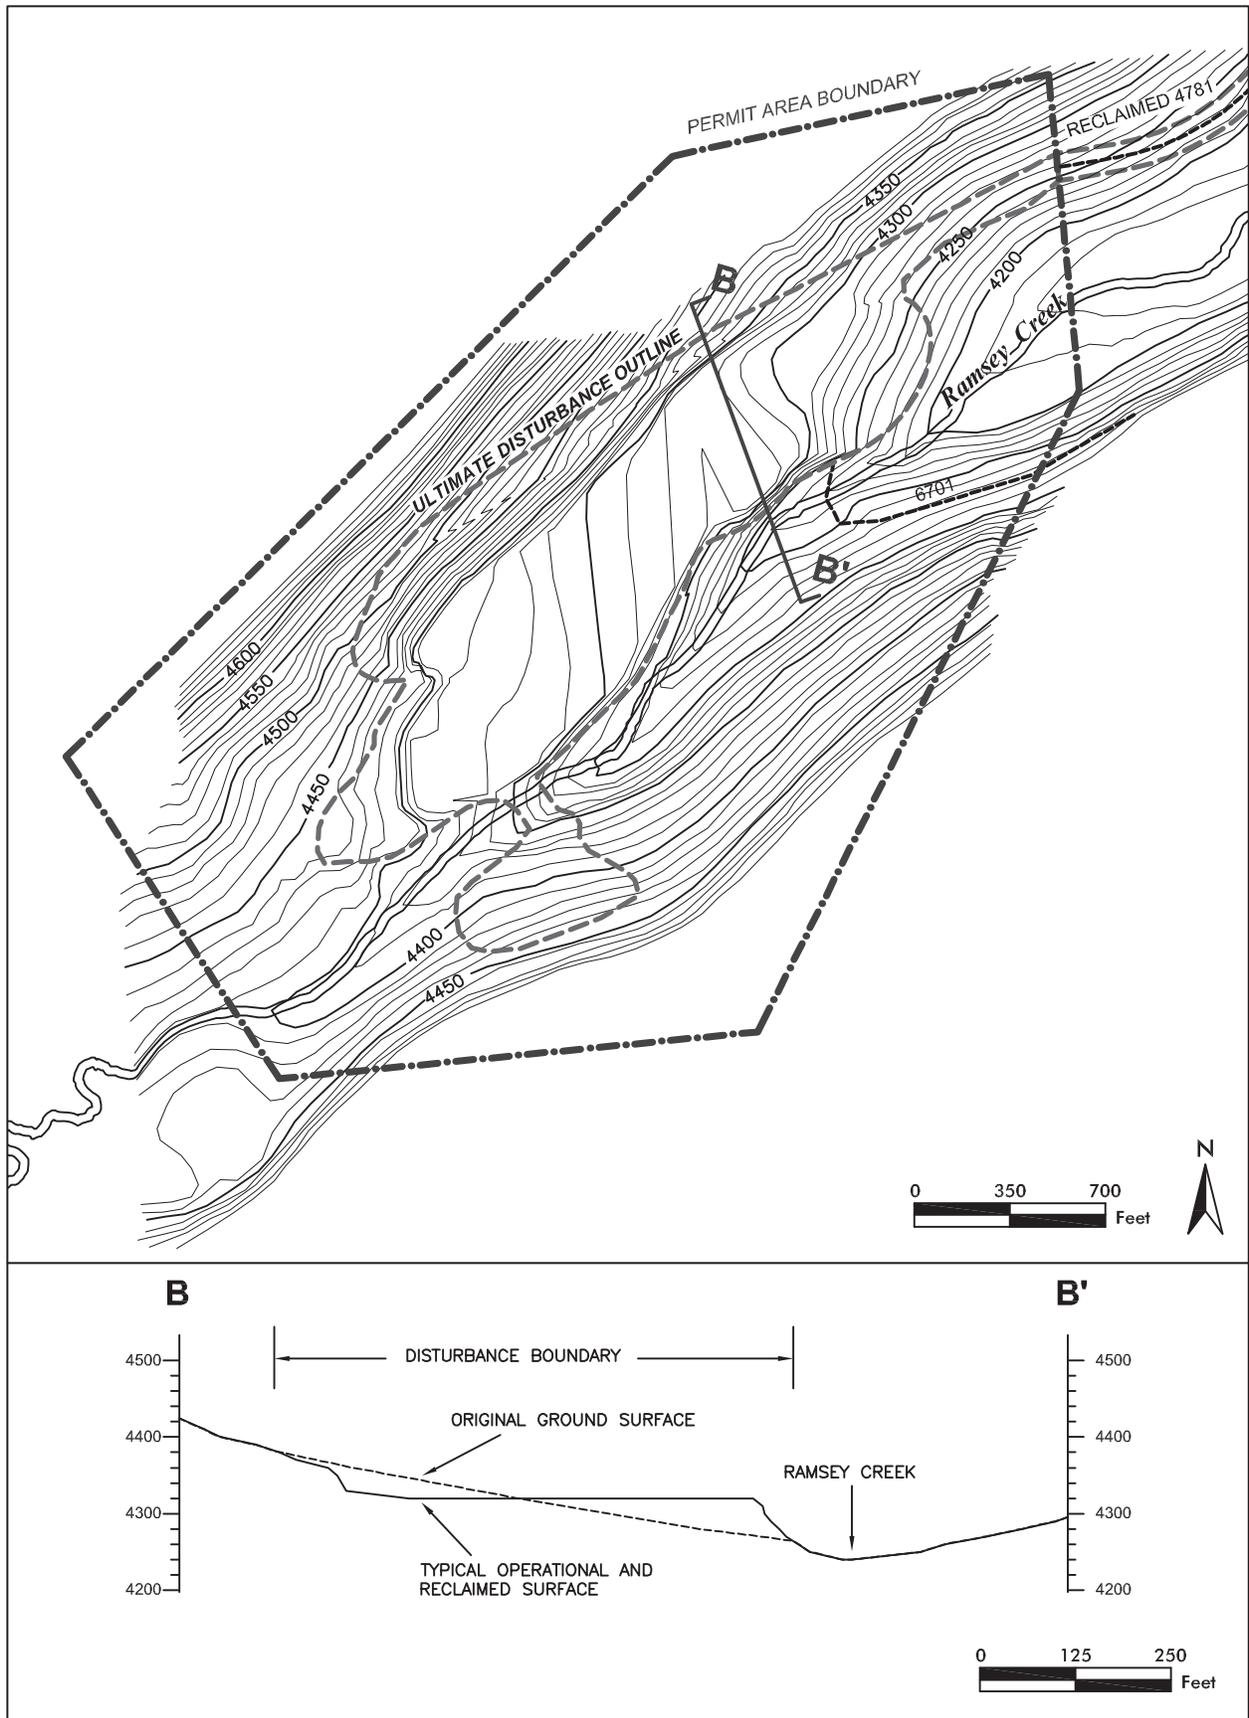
Post-mining Topography, Ramsey Plant Site, Alternative 2
